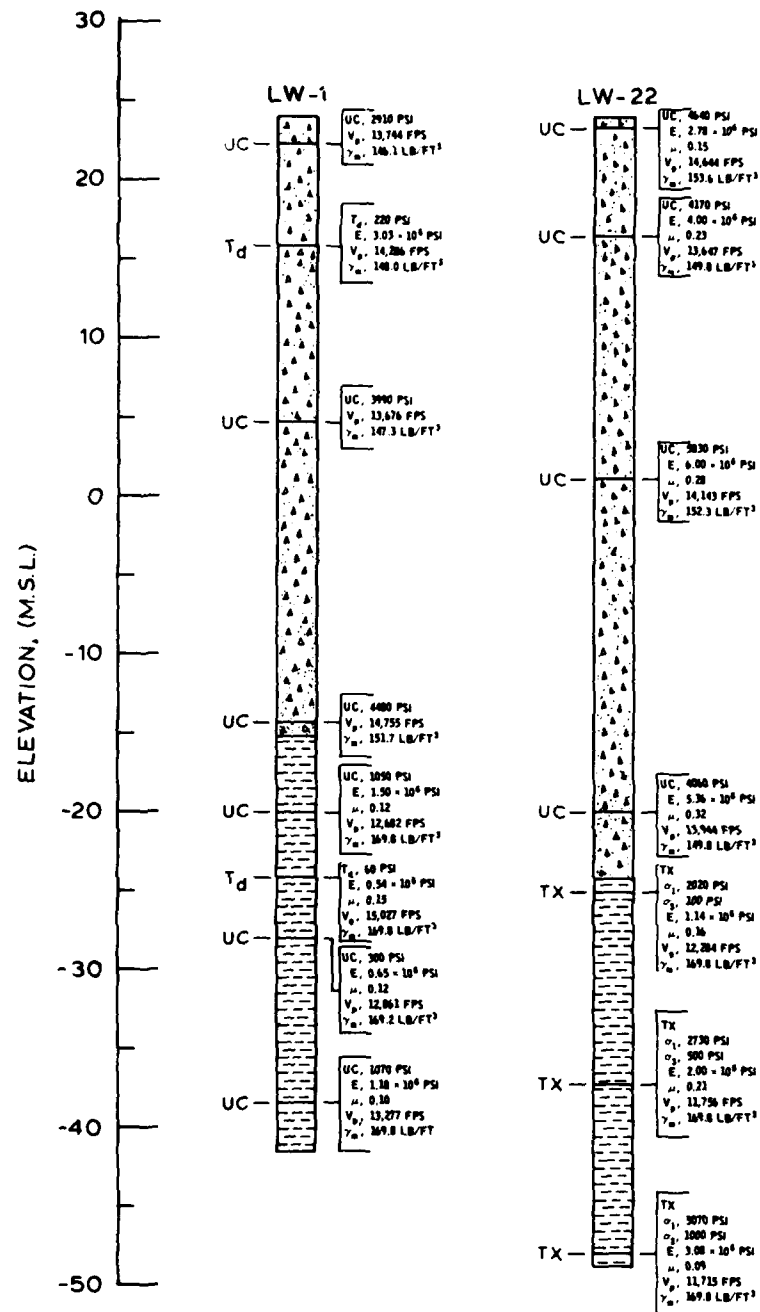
Test results from vertically drilled concrete and foundation cores (core No., type test, specimen location, and material properties) (Sheet 1 of 3)
